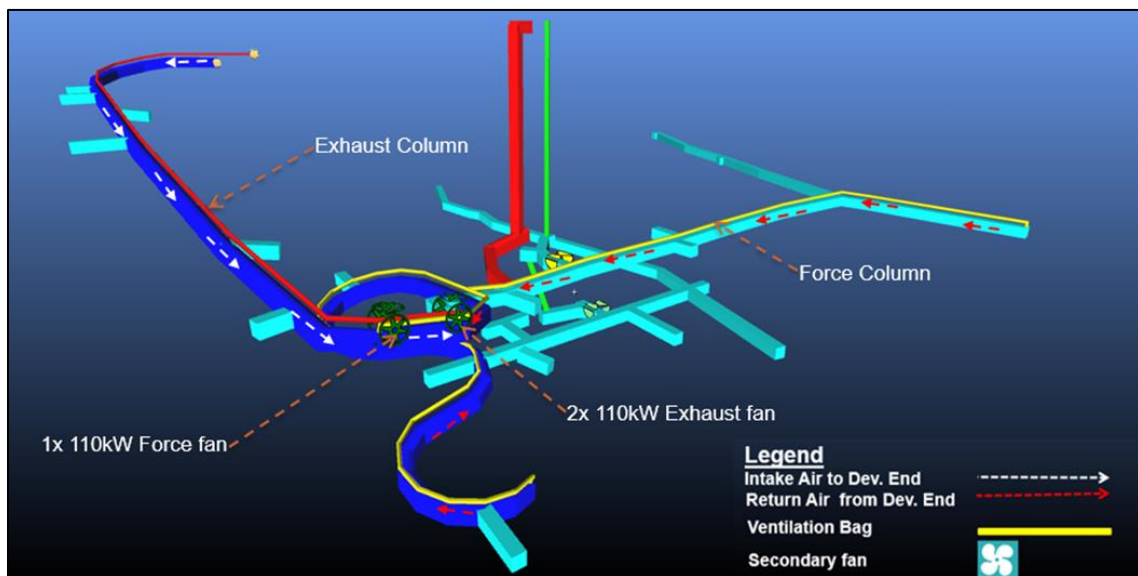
Force – Exhaust Overlap Secondary Ventilation Arrangement
